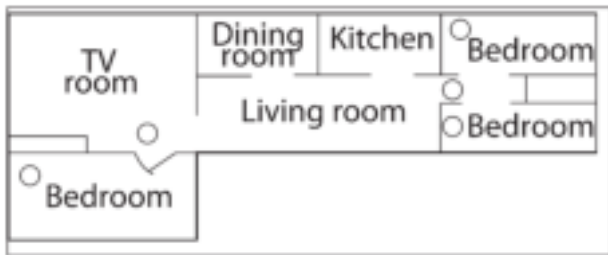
Location of the detectors in dwelling units with more than one bedroom area or with bedrooms on more than one floor
